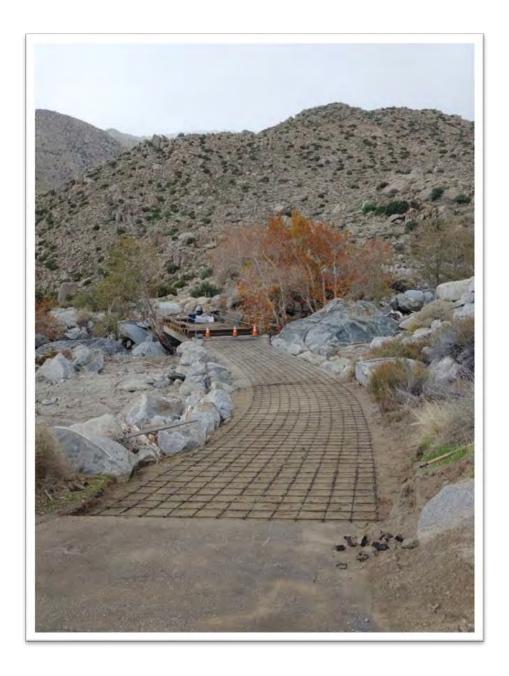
The west approach to the Falls Creek Bridge mid-construction.
